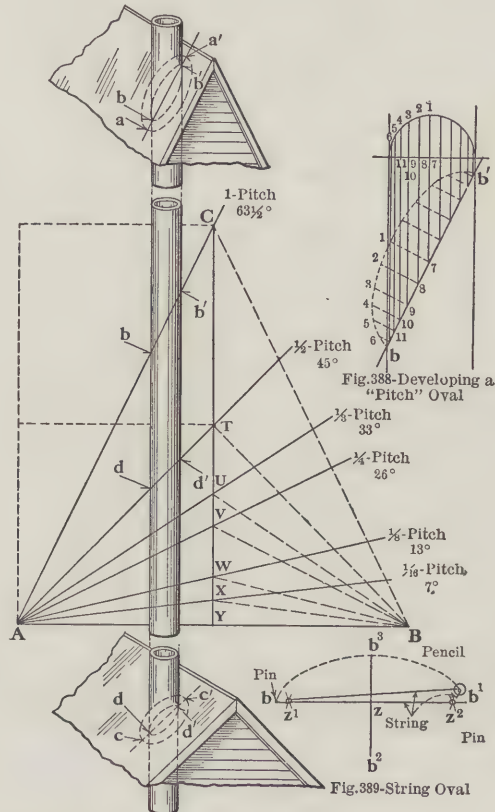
Roof Flanges. "Pitches" Roofs are constructed to
